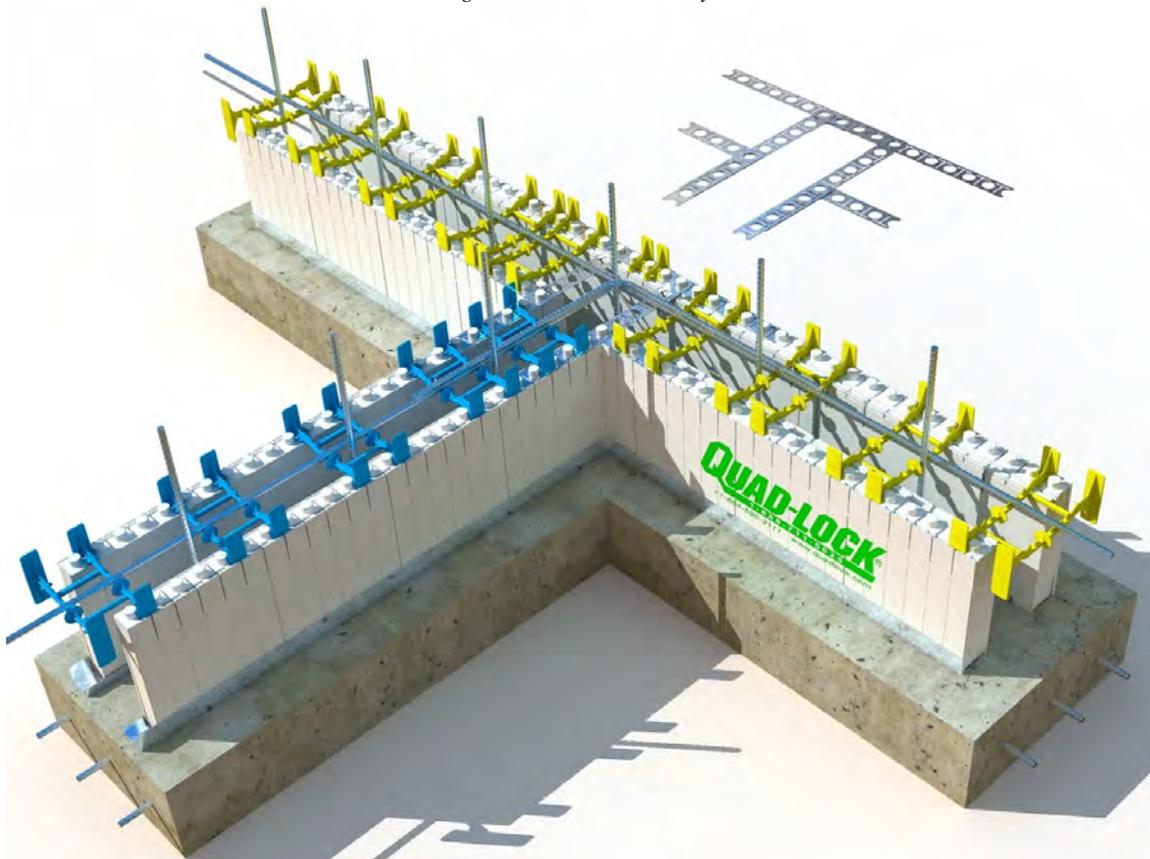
T-Wall Assembly with 2 Outside Corner Brackets and 2 Inside Corner Brackets (3D)
